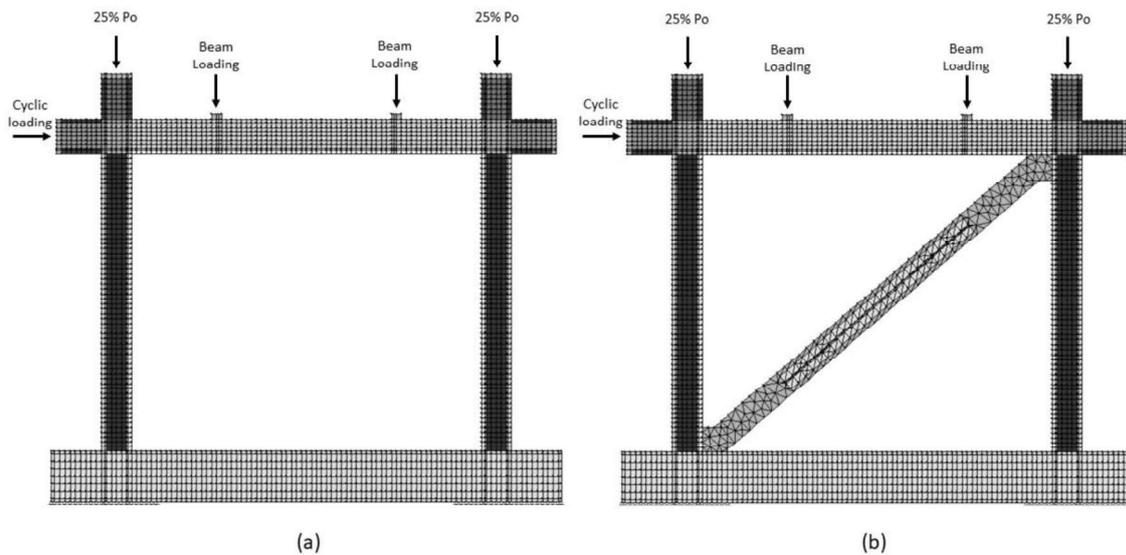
Finite element models: (a) BCF; and (b) BRB-retrofitted RC frame
